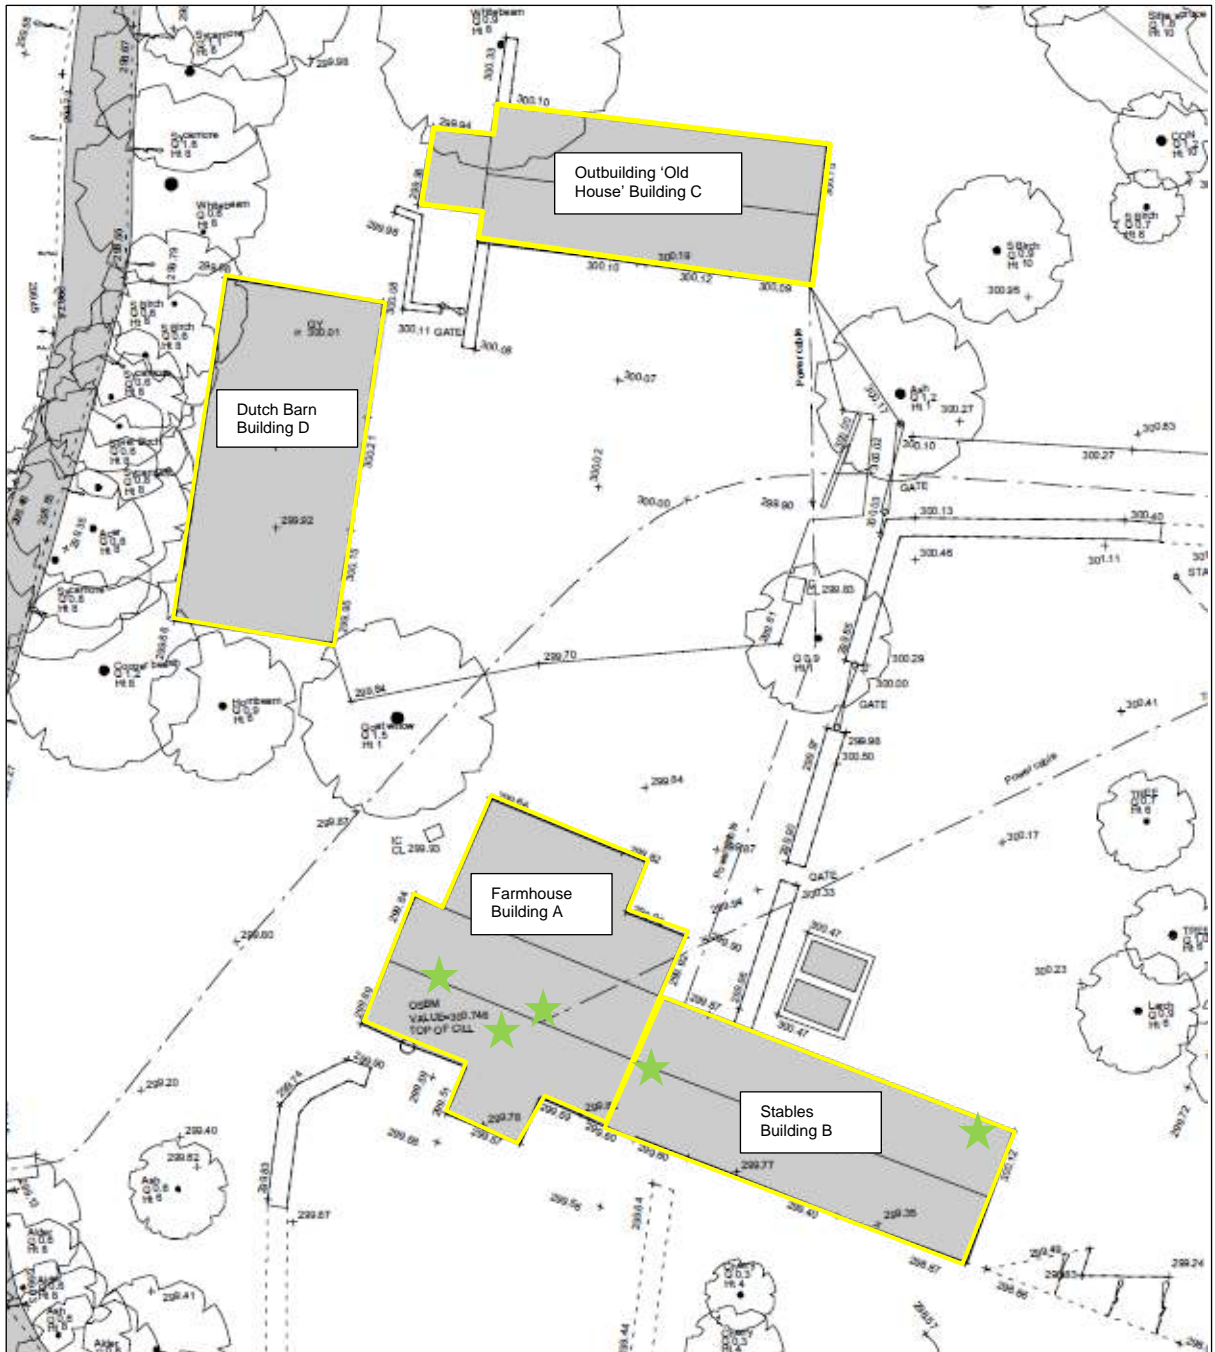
Building Plan showing where evidence of bats was found on internal survey.
